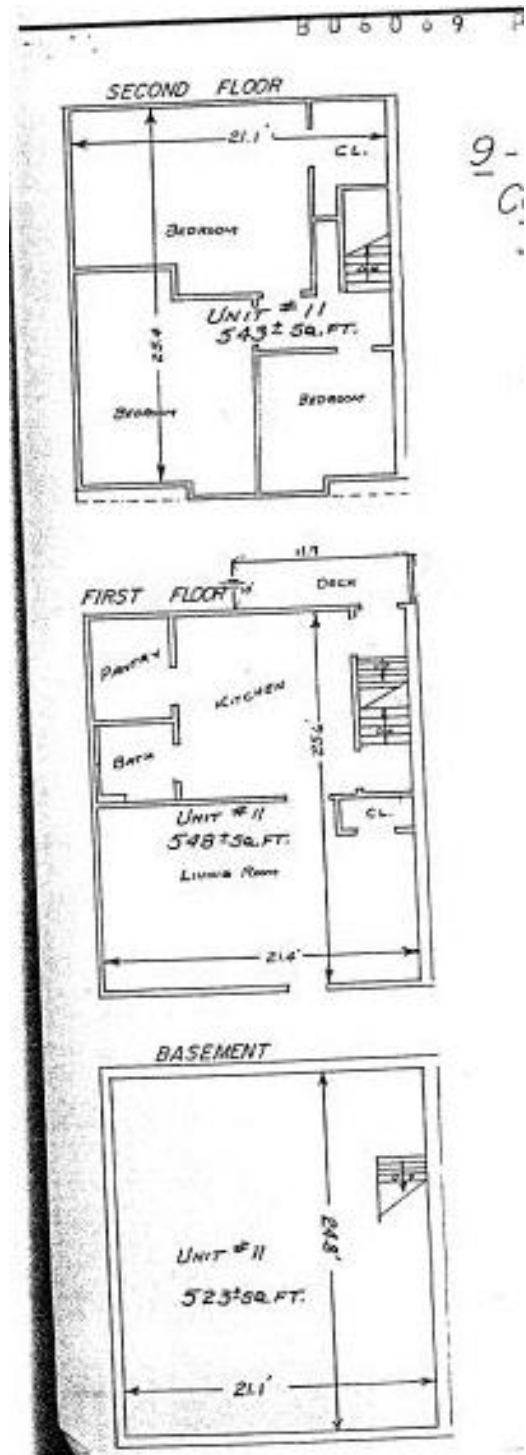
Detail of Floor Plan for #9 -11 Alder Street, c.1992 (MCRD: 06069/0115,1992)
